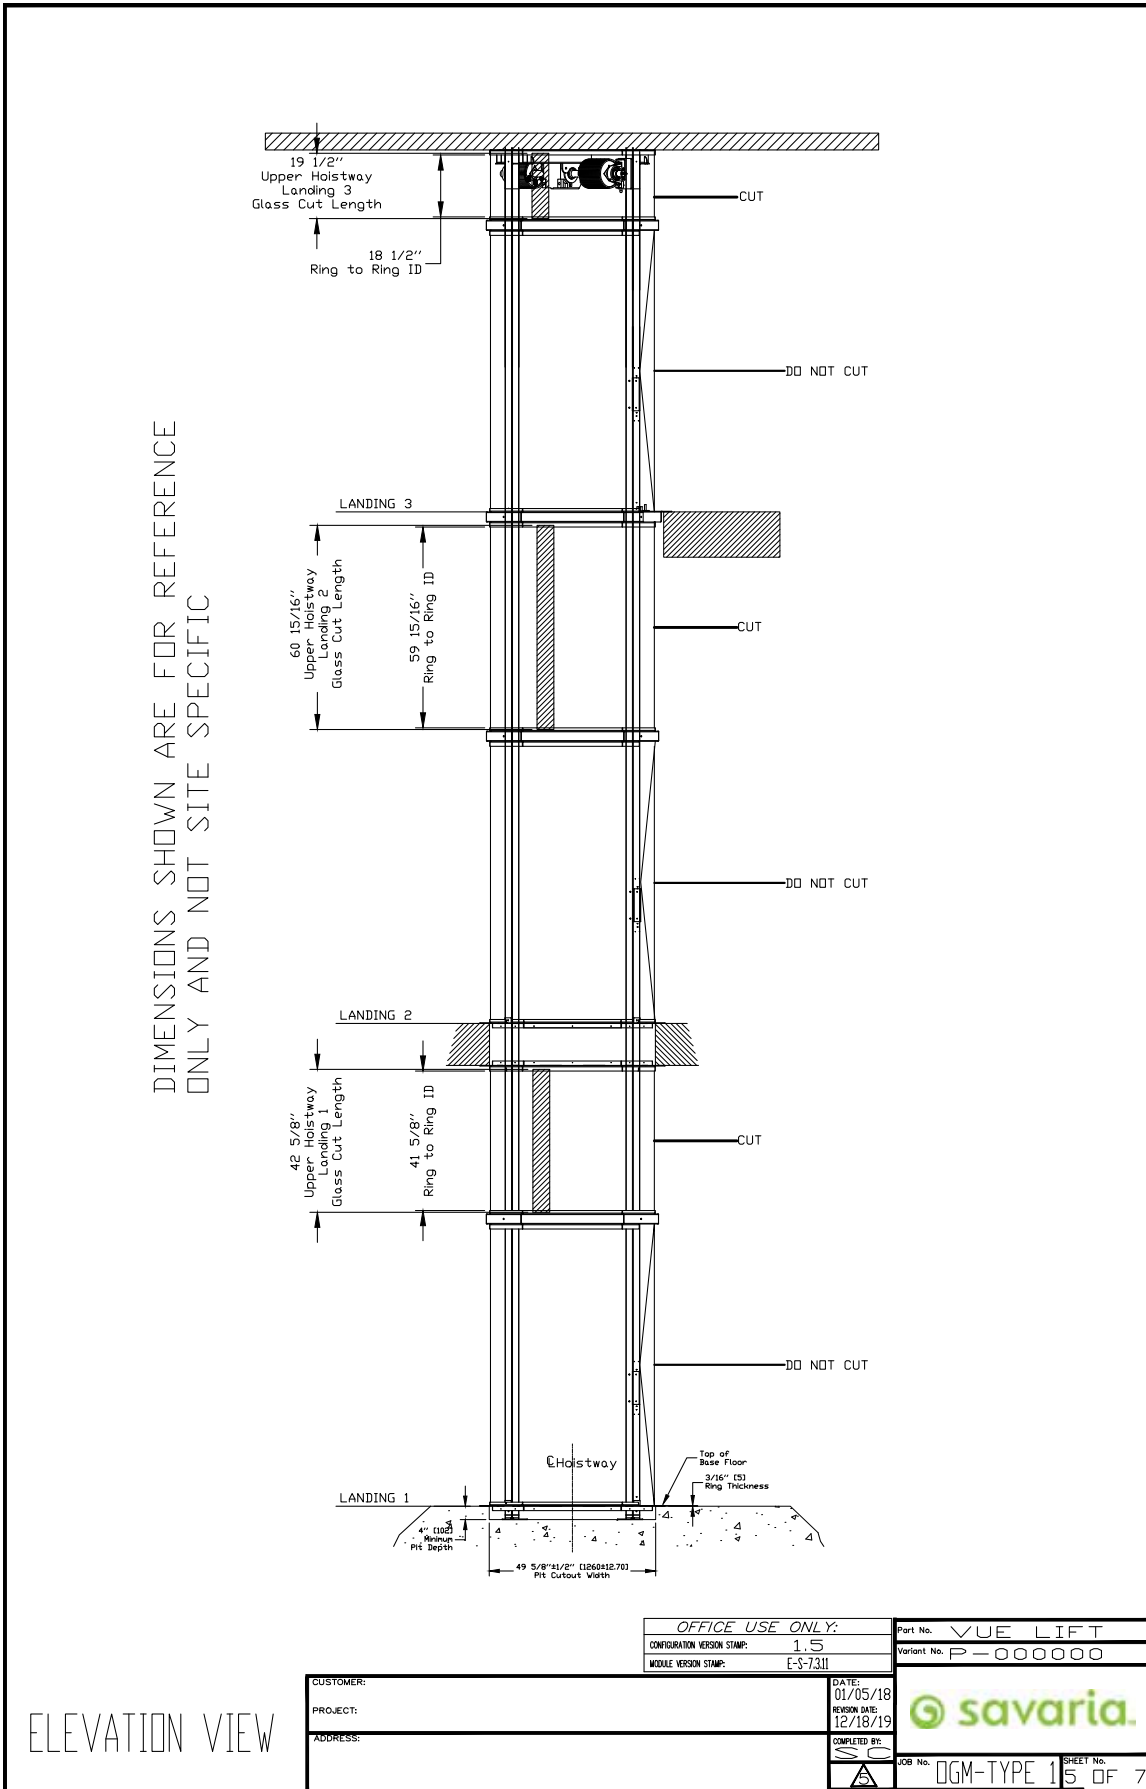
Elevation view - octagonal glass (OGM) type 1- extra header rings if floor-to-floor height > 14 ft
